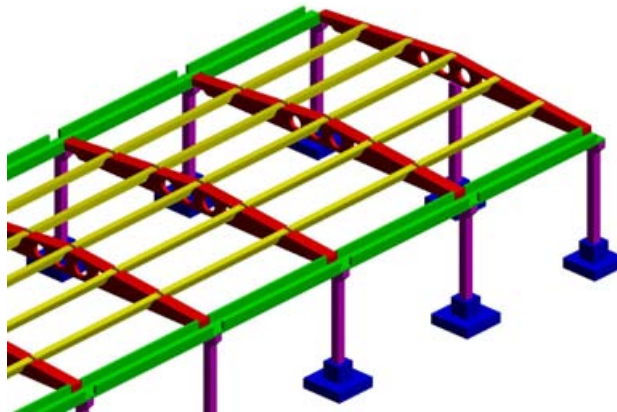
Typical elements of a prefabricated hall; foundations (blue), columns (purple), beams (green), roof girders (red), roof beams (yellow)
